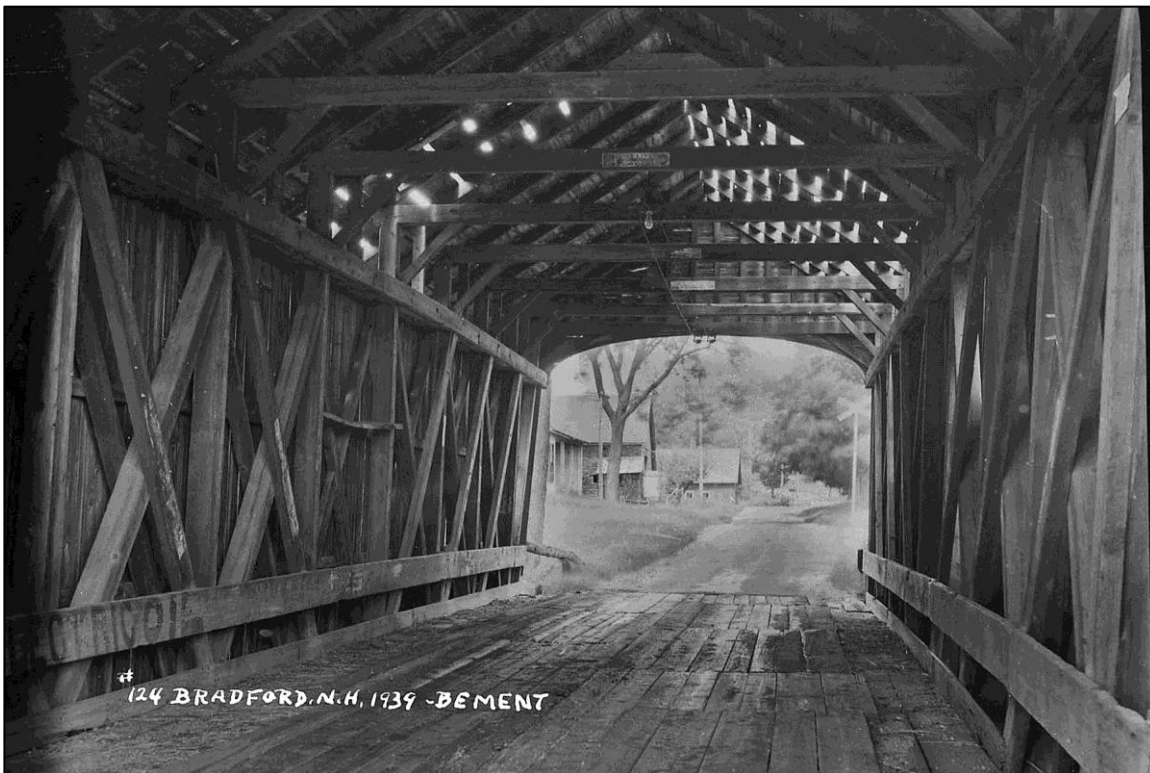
Bement Bridge, interior, looking out north portal, 1939. Note roofing missing and also former Boston & Maine Railroad right-of-way crossing Center Road just north of the bridge, now occupied by NH Route 103 (source: Town of Bradford).
